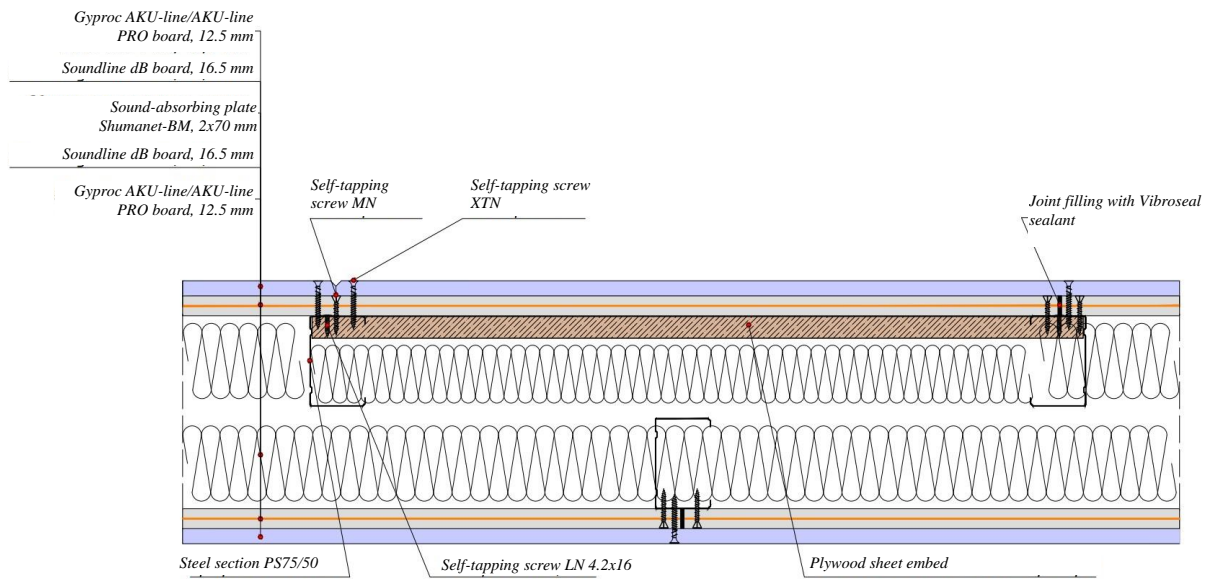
Installation of embeds in soundproofing framed partition on double (independent) frame (option 1).
